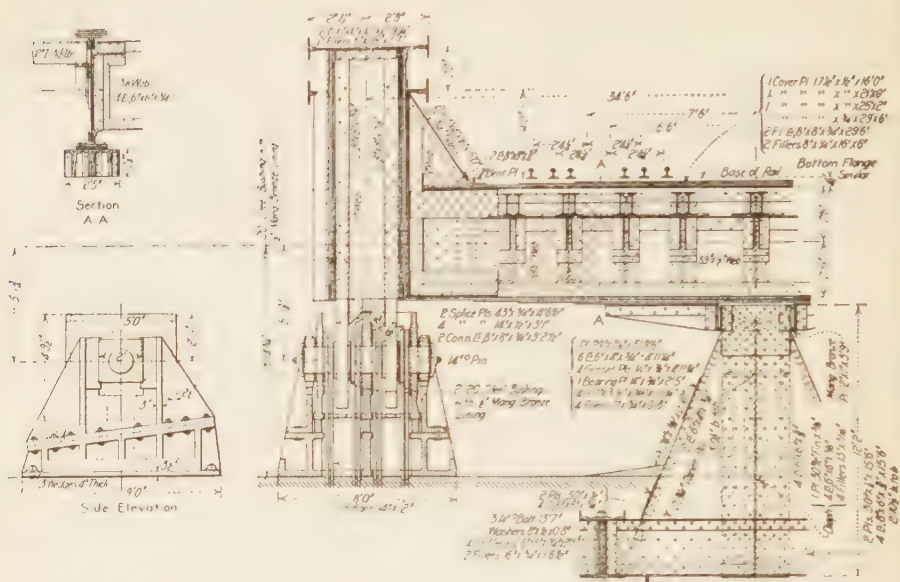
Anchorage bearing and wind abutment of Beaver Bridge.
